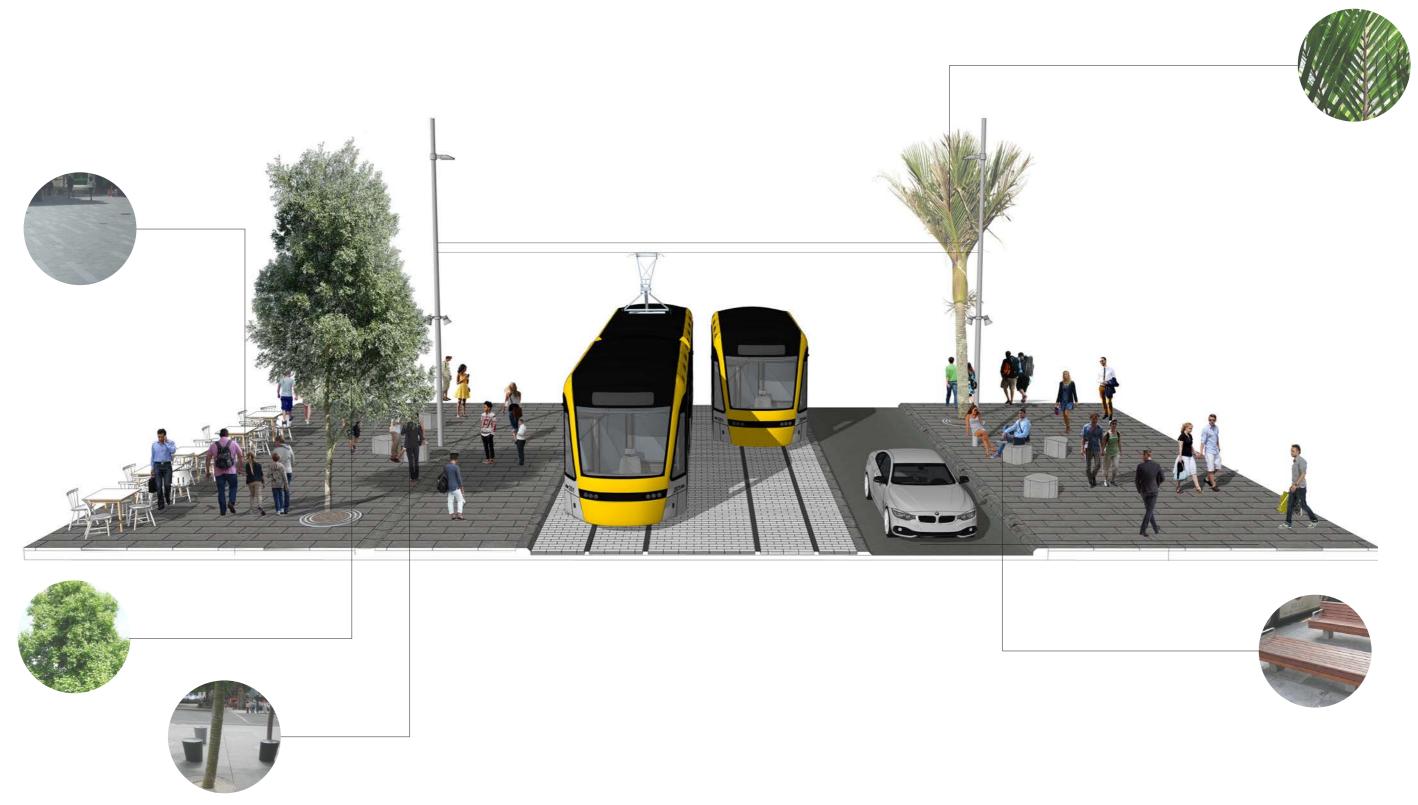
Sectional Perspective of Queen Street with LRV carriageway and indicative streetscape treatments. All existing significant street (Liriodendron) street trees retained. Side mounted catenary poles. Existing footpath widened on west (Town Hall side) by 1600mm. Existing heritage kerbs integrated within footpath.
